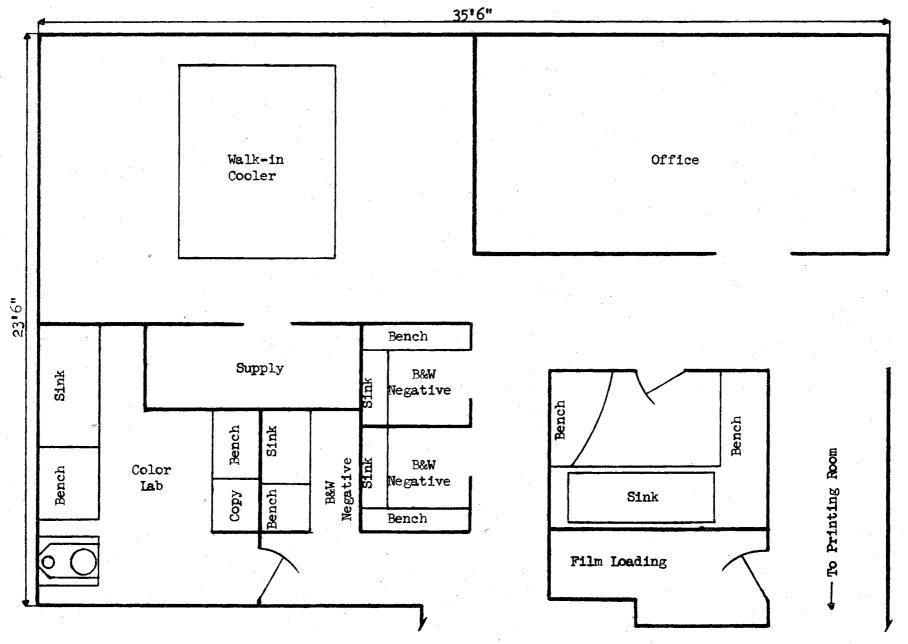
DARKROOM FLOOR PLAN - DAILY OKLAHOMAN-TIMES. (SCALE 1/4" = 1')
